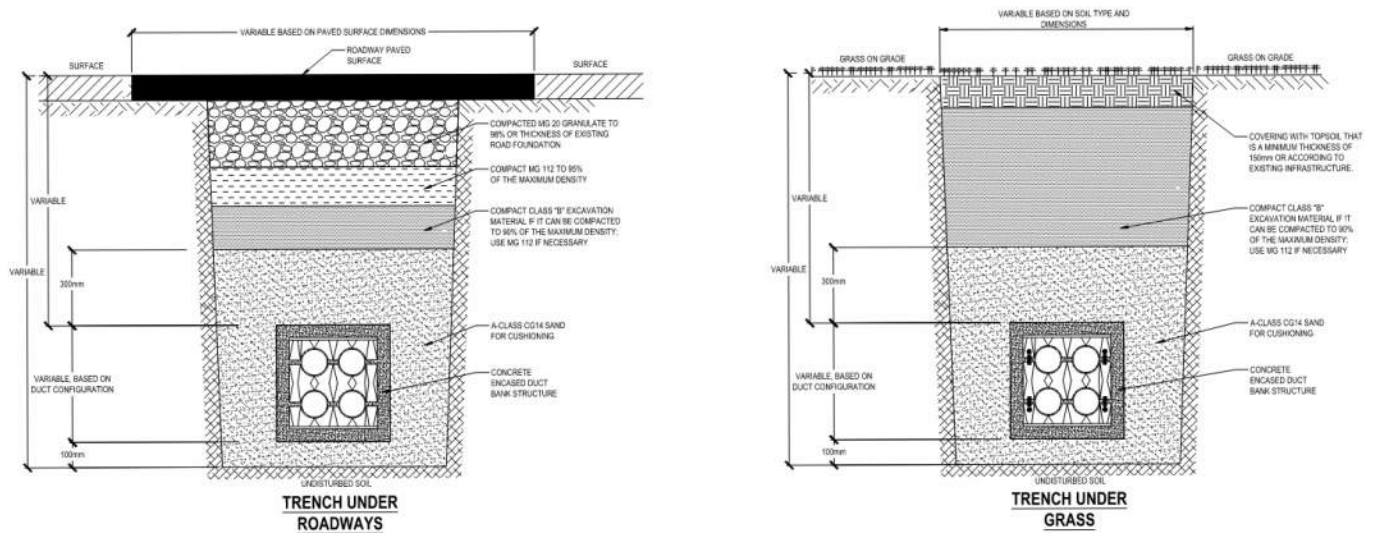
Trenching For Underground Concrete-Encased Pathways Typical (Attain Drawing Page #9)
